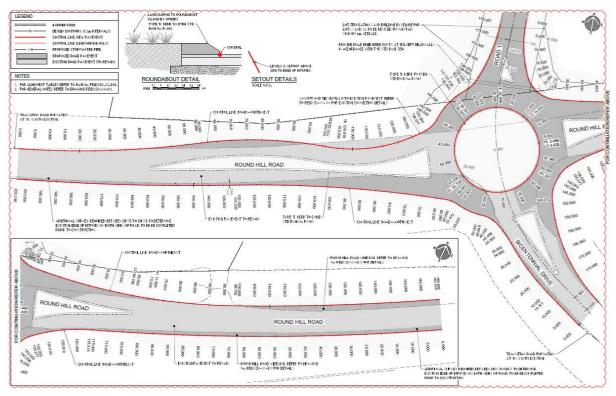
Proposed Roundabout Design for 2773 Round Hill Road
